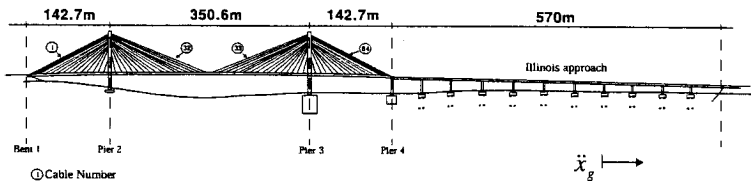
SCHEMATIC OF THE CAPE GIRARDEAU BRIDGE (Dyke *et al.*, 2000)
